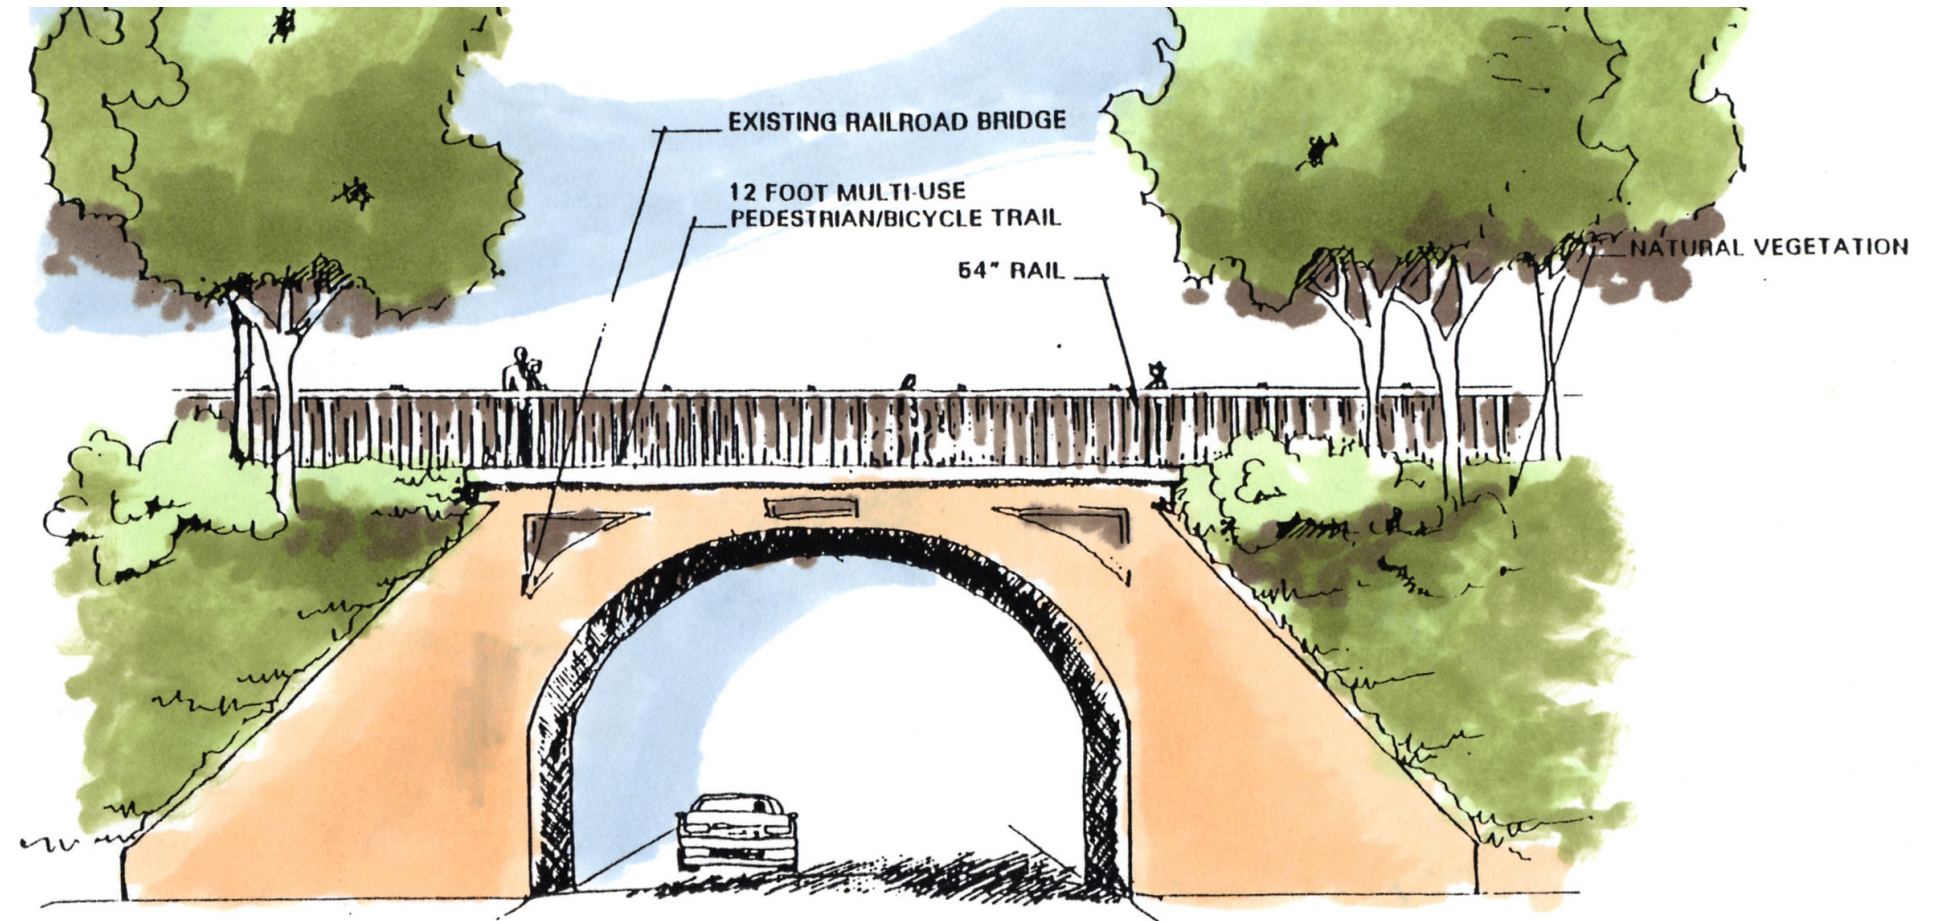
Rendering of Proposed Rail Trail (Courtesy of KPS Group)
